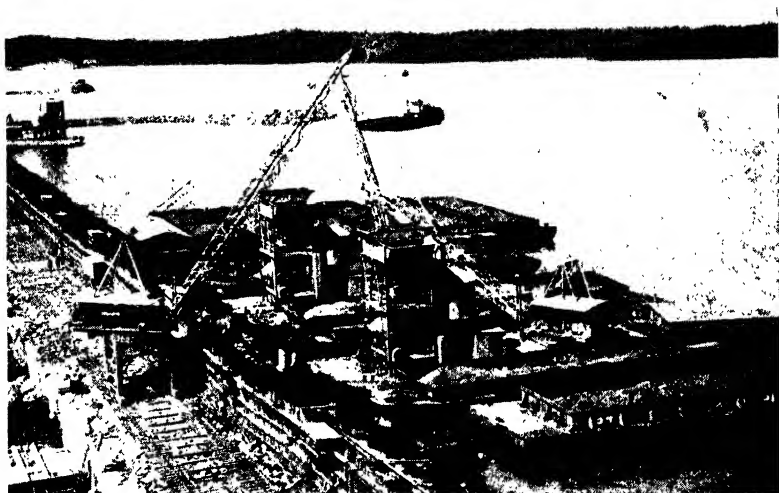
Floating mixing plants at Wheeler Dam; concrete-placing crane at left.
